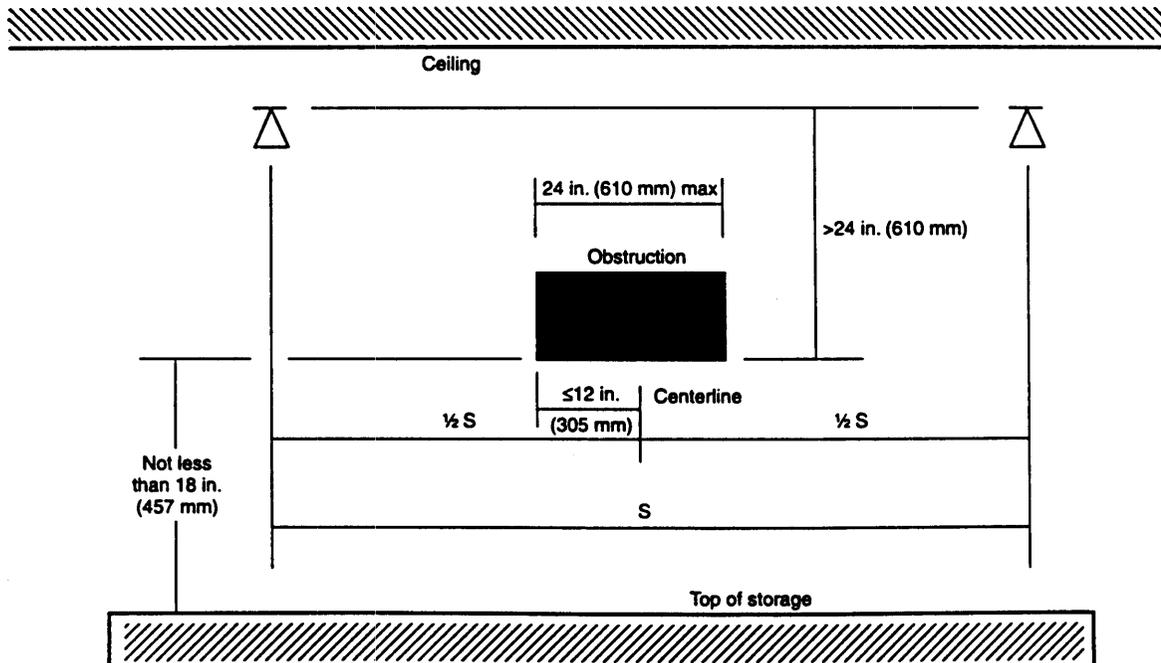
Obstruction more than 24 in. (610 mm) below the sprinkler (large-drop sprinkler).
